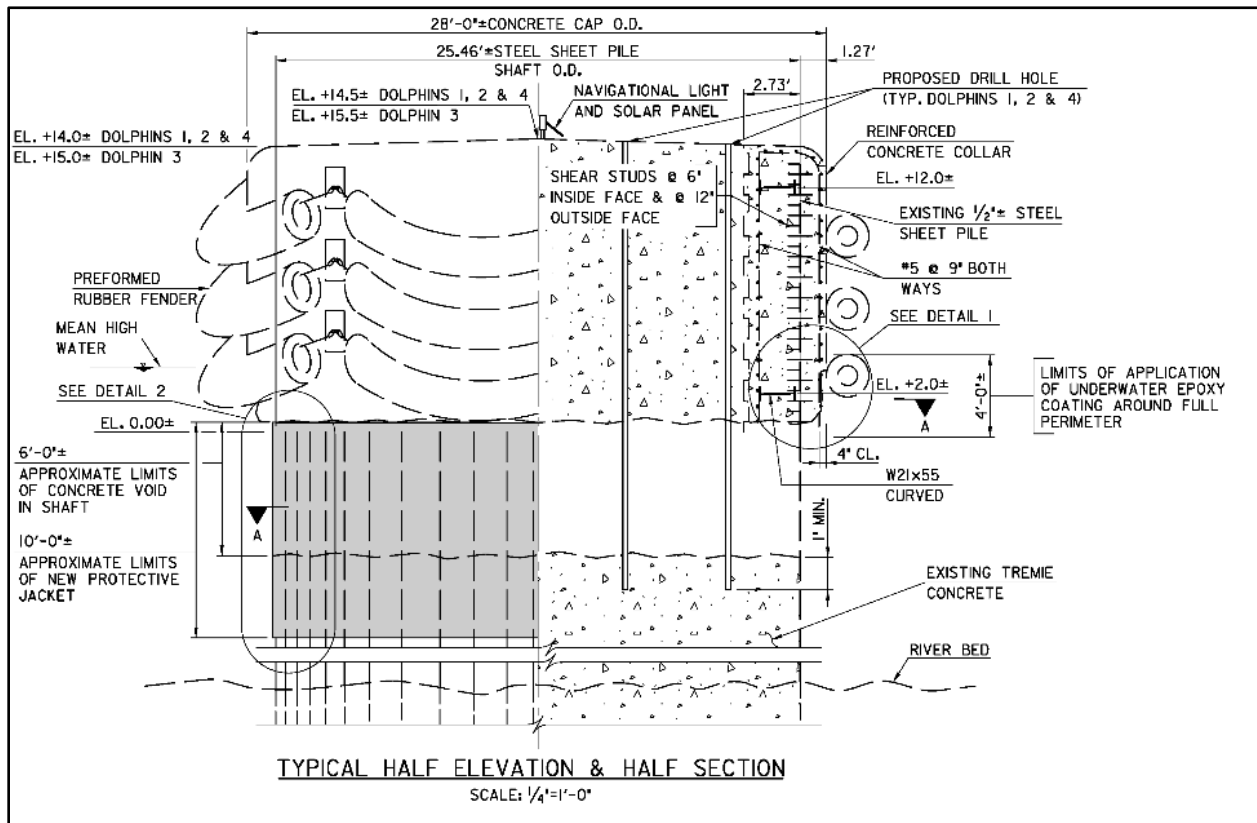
Typical half-elevation/section view of a Key Bridge dolphin. (Source: MDTA)
